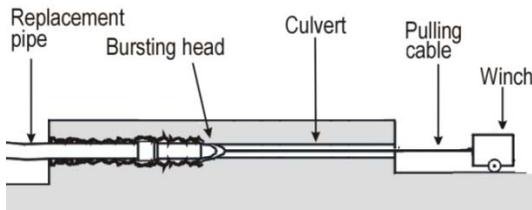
Pipe bursting of culverts (Simicevic and Sterling, 2001)
